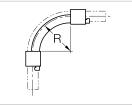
REHAU pipe guide bends Sanitary/Heater 5 x d 90 degrees for dimension 32; R = bending radius
